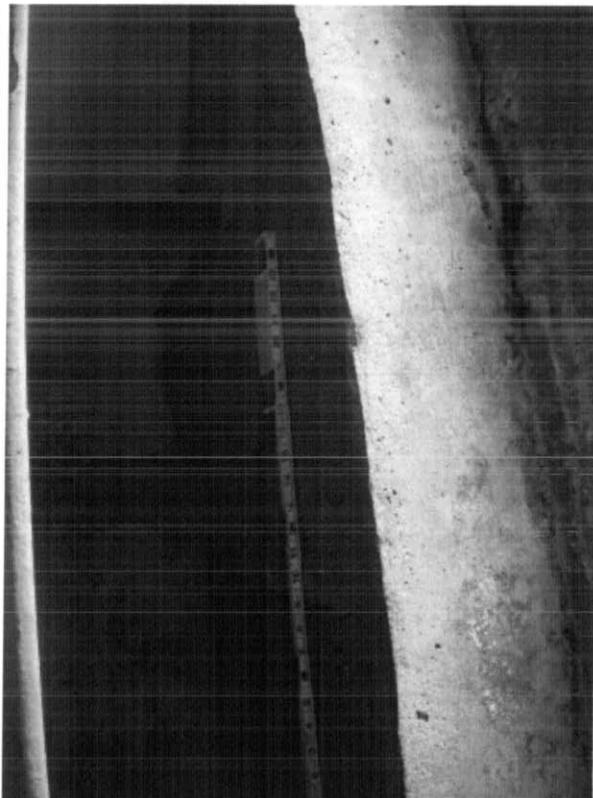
North Abutment, west end of abutment, looking north – Lateral movement of superstructure to the west up to 1-inch relative to the Northwest Wingwall and the cheekwall.
